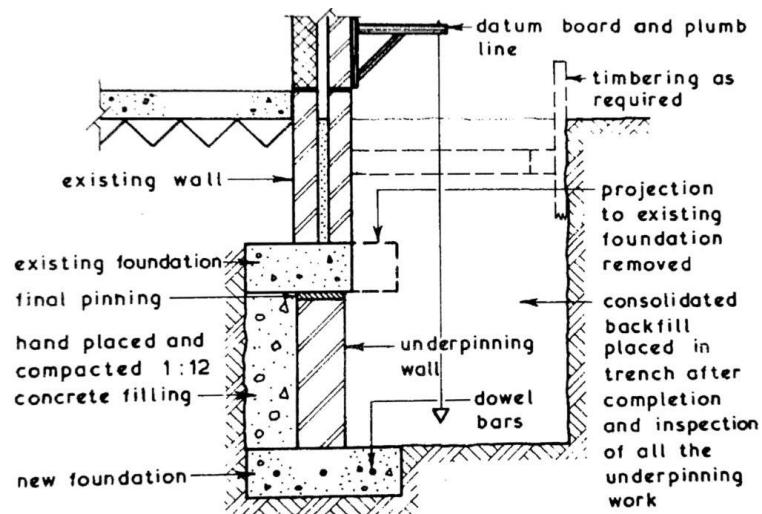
Typical Traditional Underpinning details- typical section of Underpinning Bay
